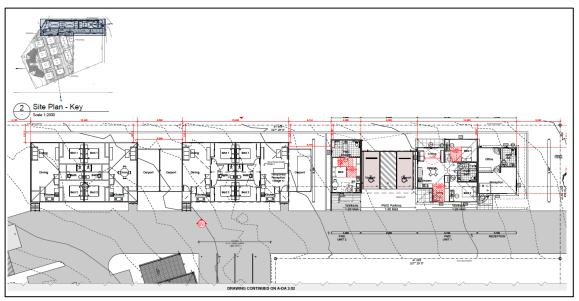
Proposed Floor Plans: Duplex 1 & 2 and PWD Unit 1 & 2
